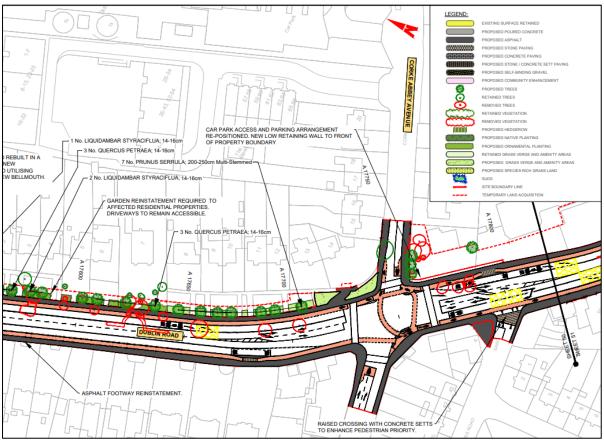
Extract from Landscaping Design Drawings at Dublin Road (Sheet 50)
